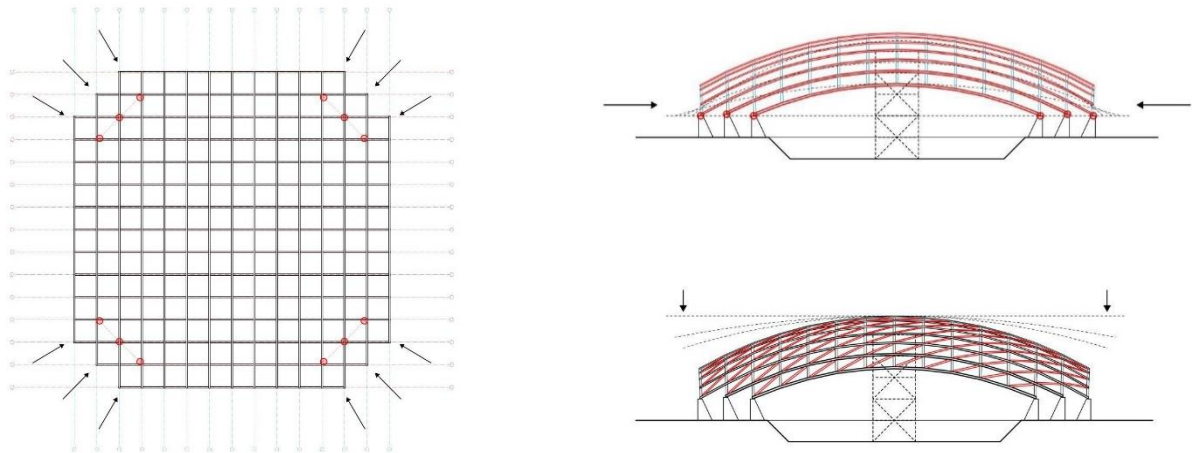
Erection process. Plan view and sections of supports translation, bamboo scaffolding and bracing application.
